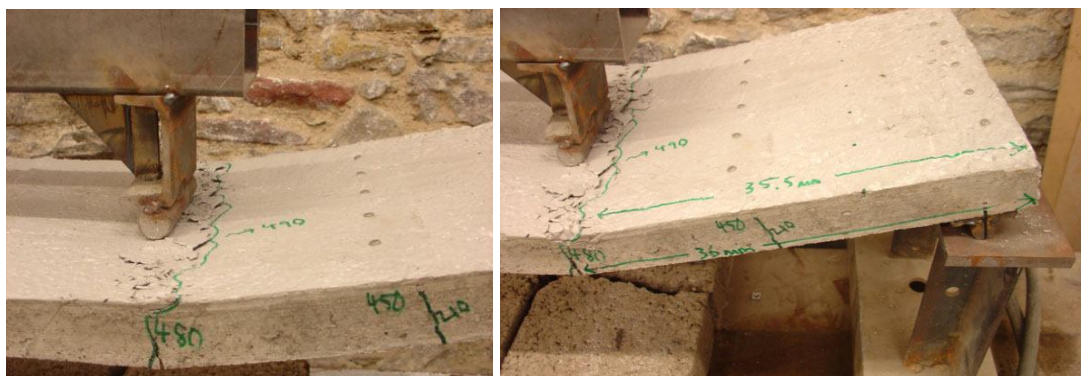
11DA10mm at failure; Flexure Cracks
